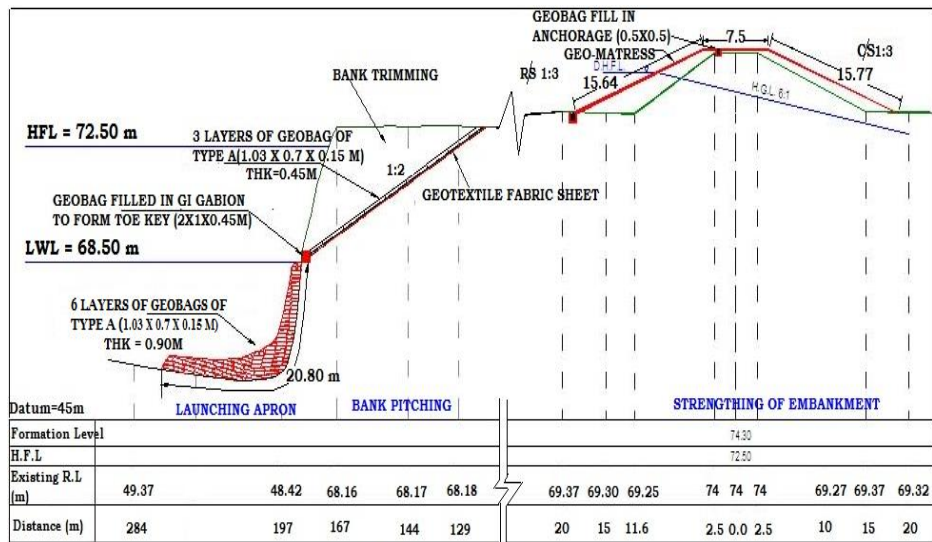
Cross section of apron, bank pitching and embankment work at Biswanath Reach.
